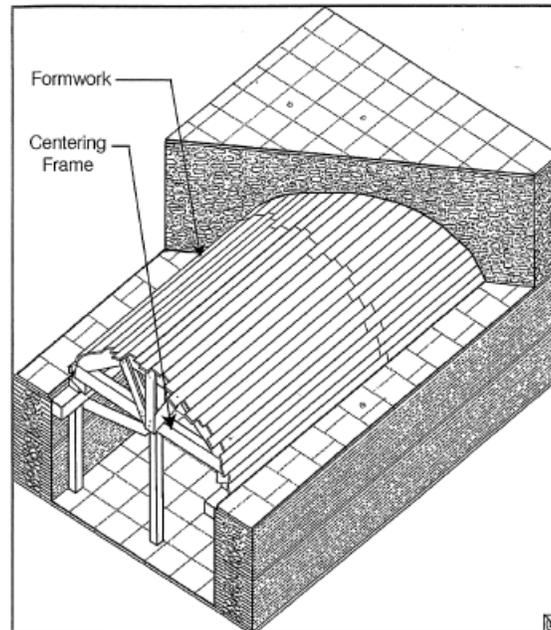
Reconstruction of traditional wooden centering scheme for a barrel vault.
